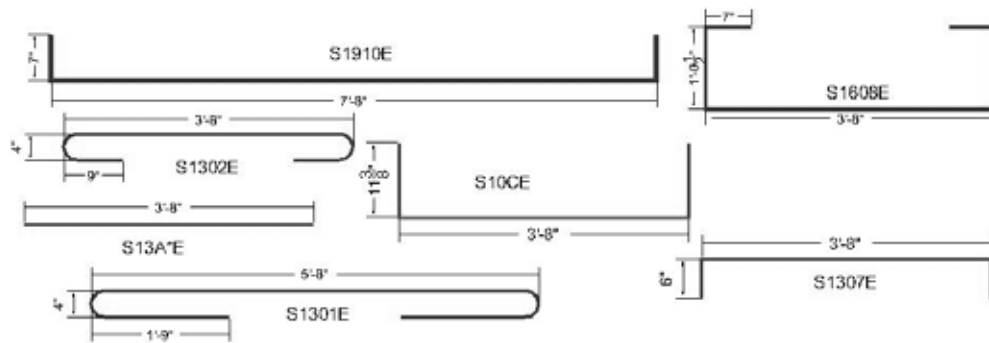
As-built cross section and reinforcement details for the west end of Beam 2N
